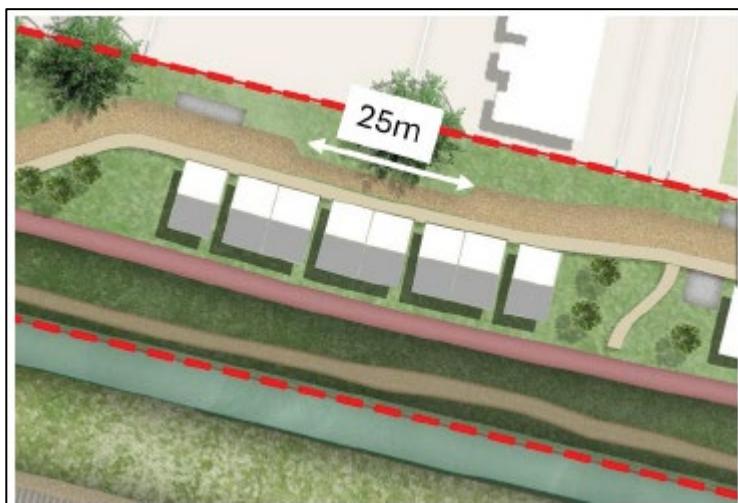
Proposed Section with Yield System (Extract from Figure 6-2 of the Draft Old School House Masterplan, FCC 2025)
